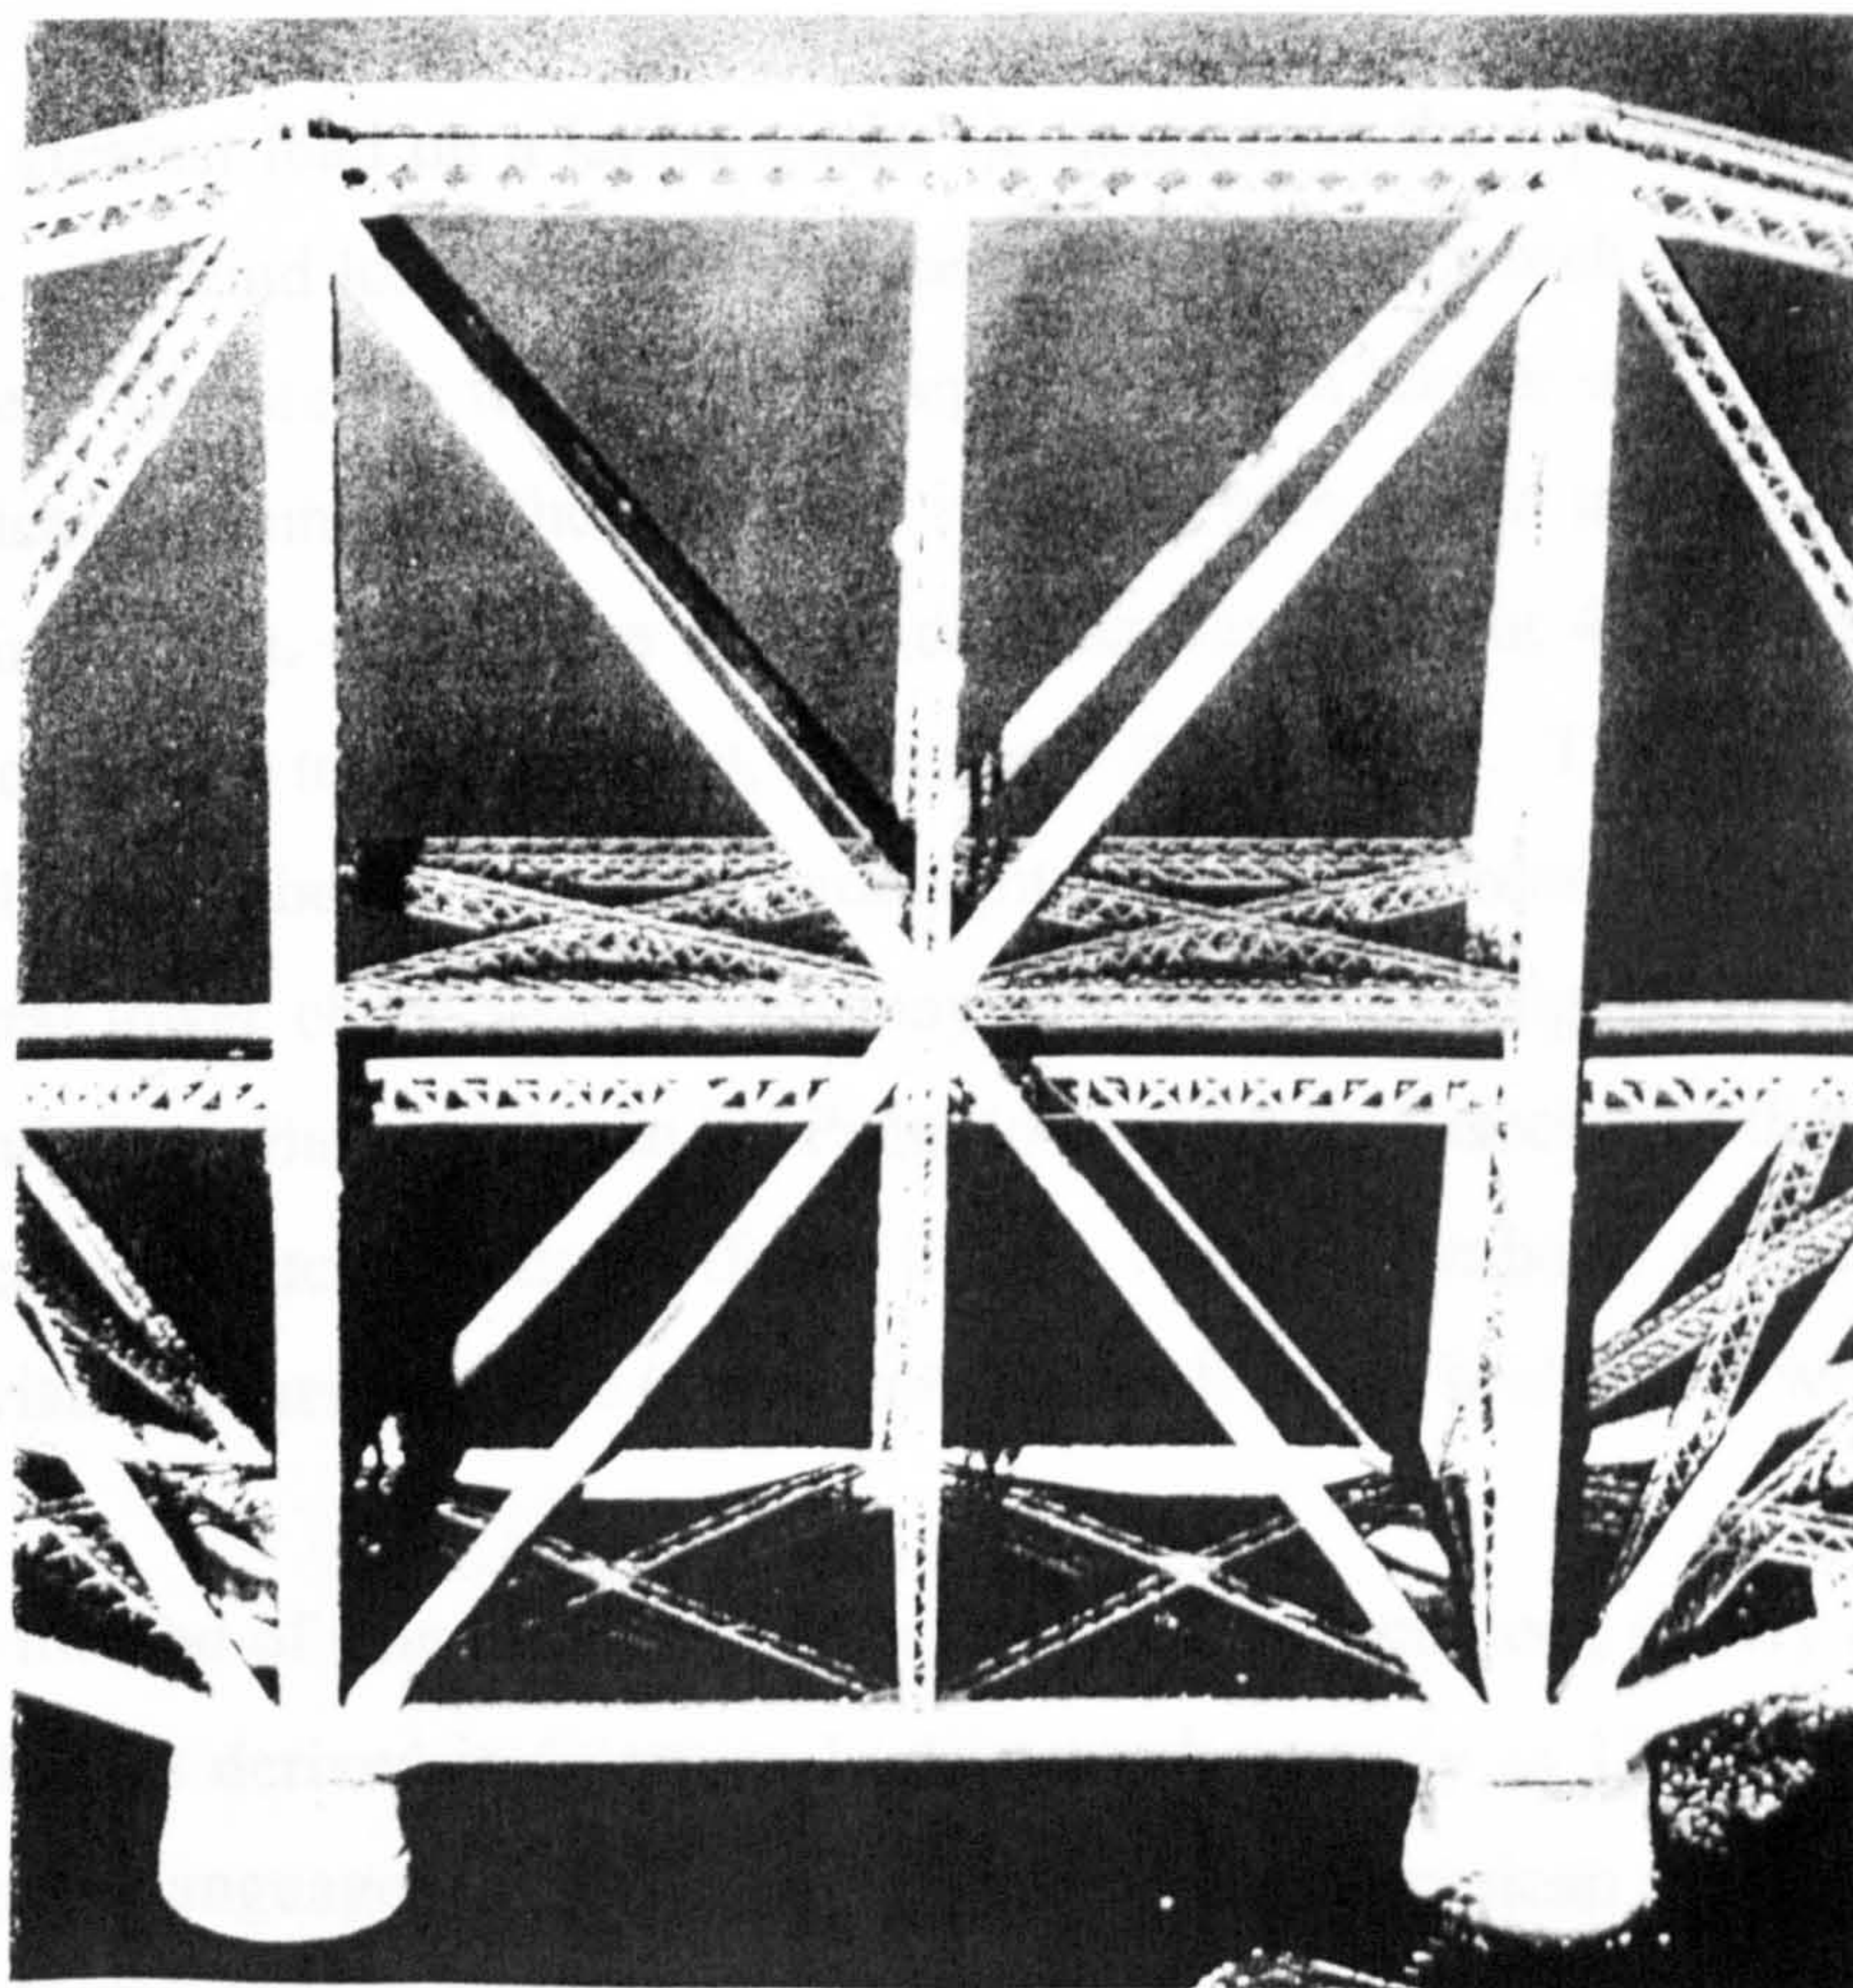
Inchgarvie Tower, Forth bridge. Note superfluous upper central member, not present in Baker's later final design, Fig. 56. (Shipway, 1990)
